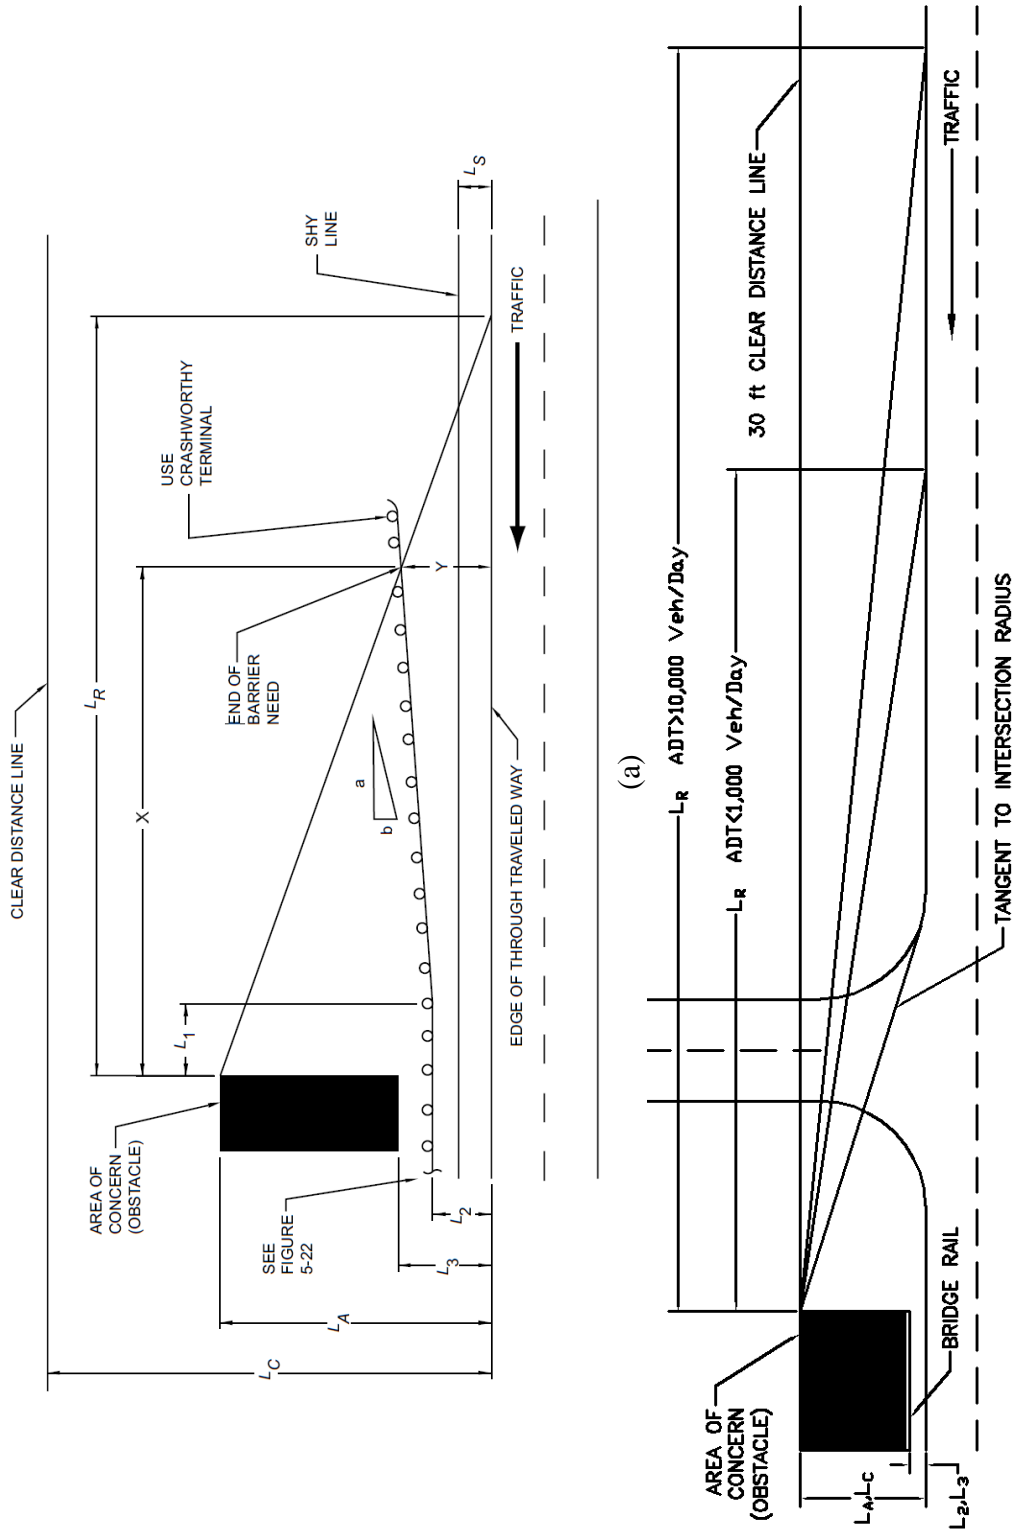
(a) Approach Guardrail with Variables [1], (b) Intersection Near Bridge with Variables
